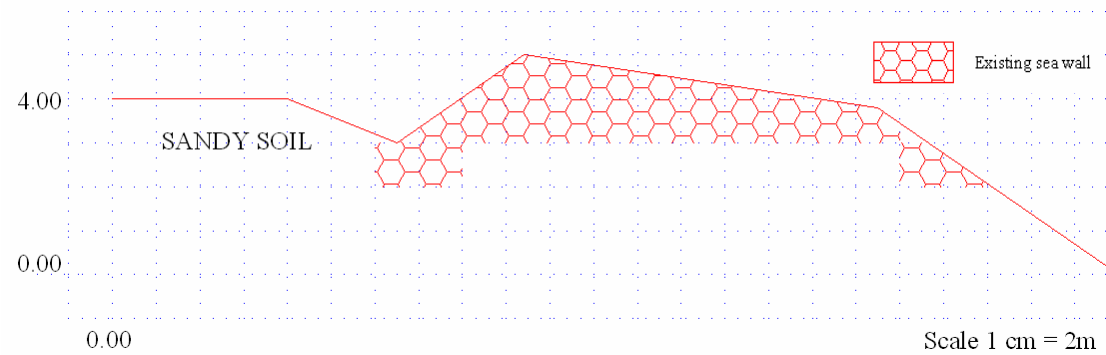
Cross-section of the existing damaged seawall (as per KID) at Sraikkadu
